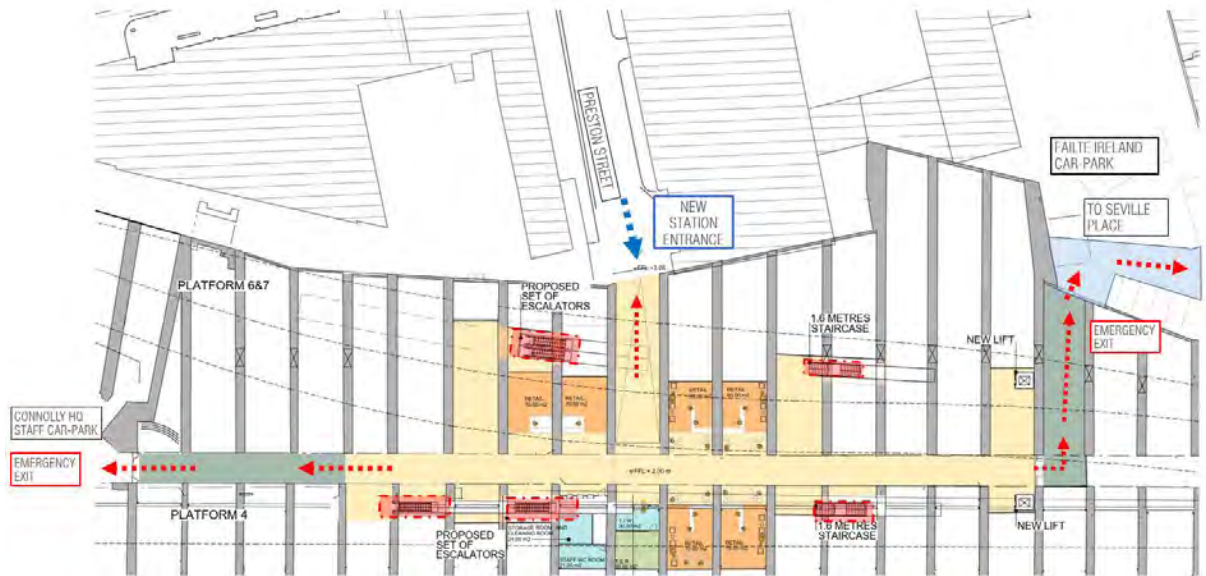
Plan view of the proposed layout within the Connolly Station vaults
